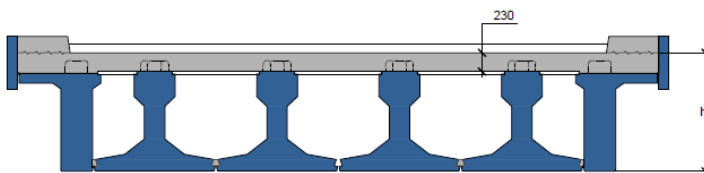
Cross section of prefab deck using inverted T-beams – Spanbeton
